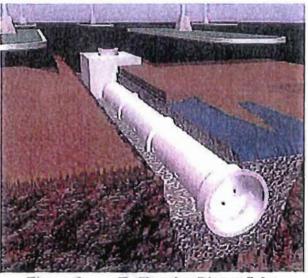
Exfiltration Pipe at Inlet (Picture provided by Oldcastle Precast)
